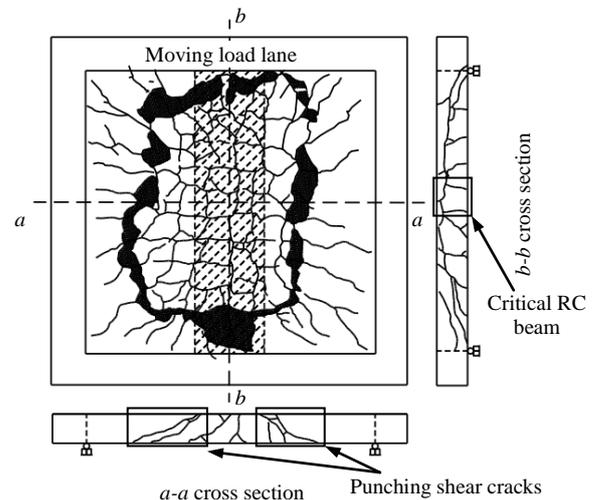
A typical failure crack pattern of an RC slab under cyclic moving loads
